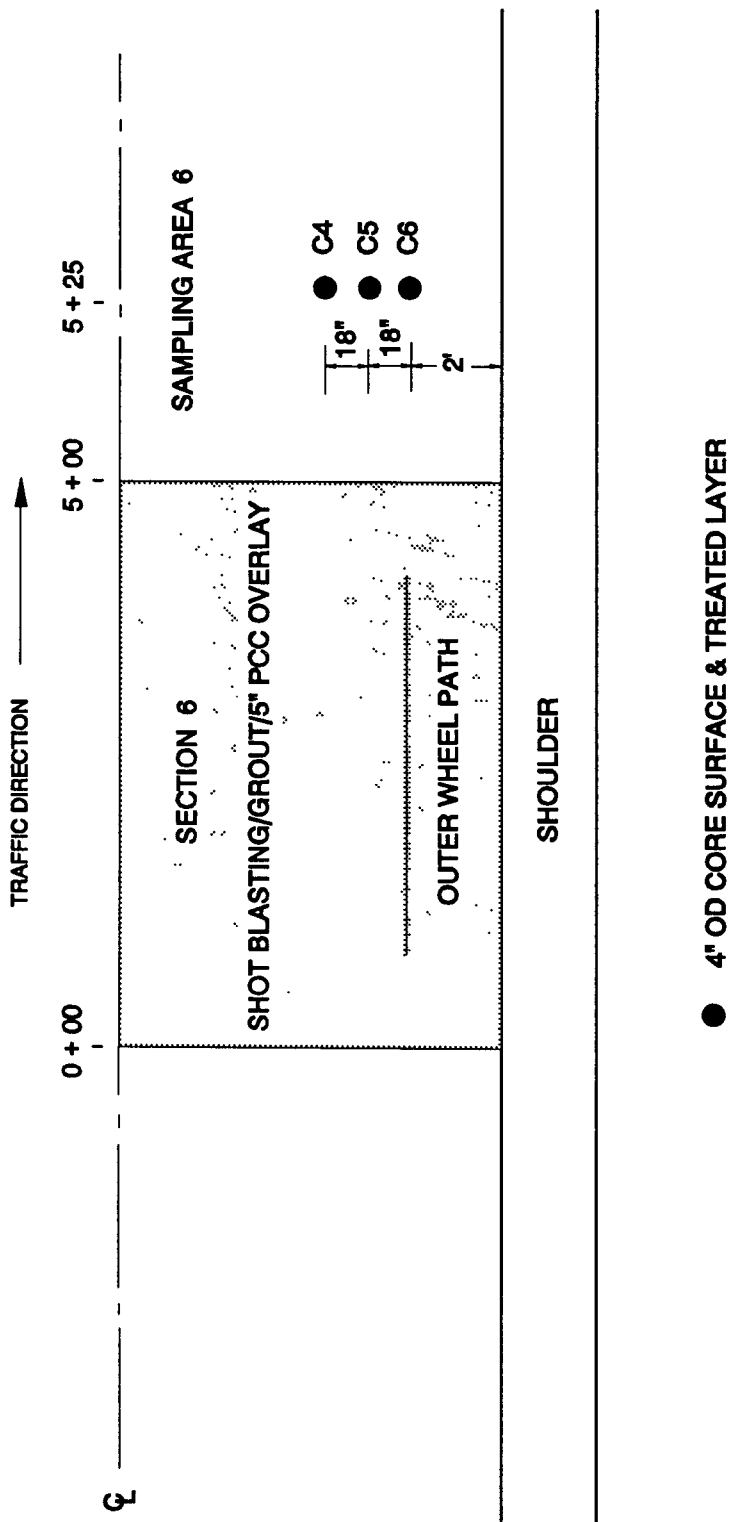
Example of "Pre-Construction" Sampling Plan for Test Section 6
